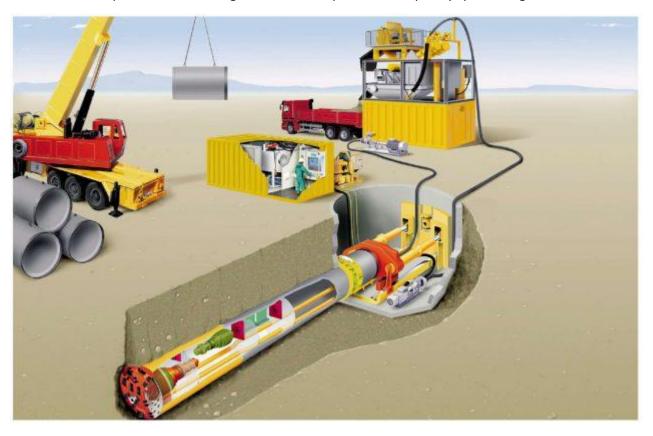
Microtunnelling schematic showing shaft and microtunnel boring machine (image courtesy of Herrenknecht and SDL)
